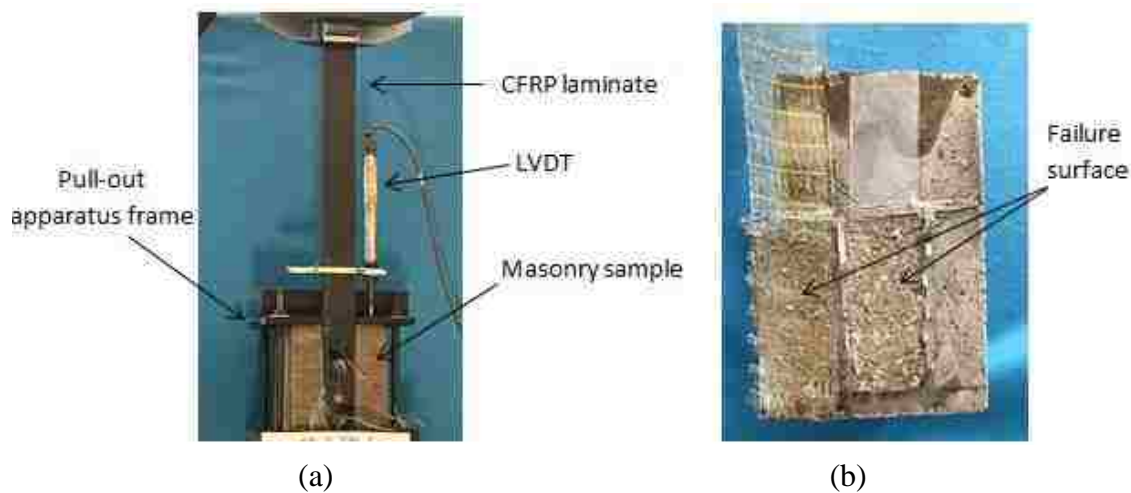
Pull-out test: (a) test setup, (b) GFRP bond failure
